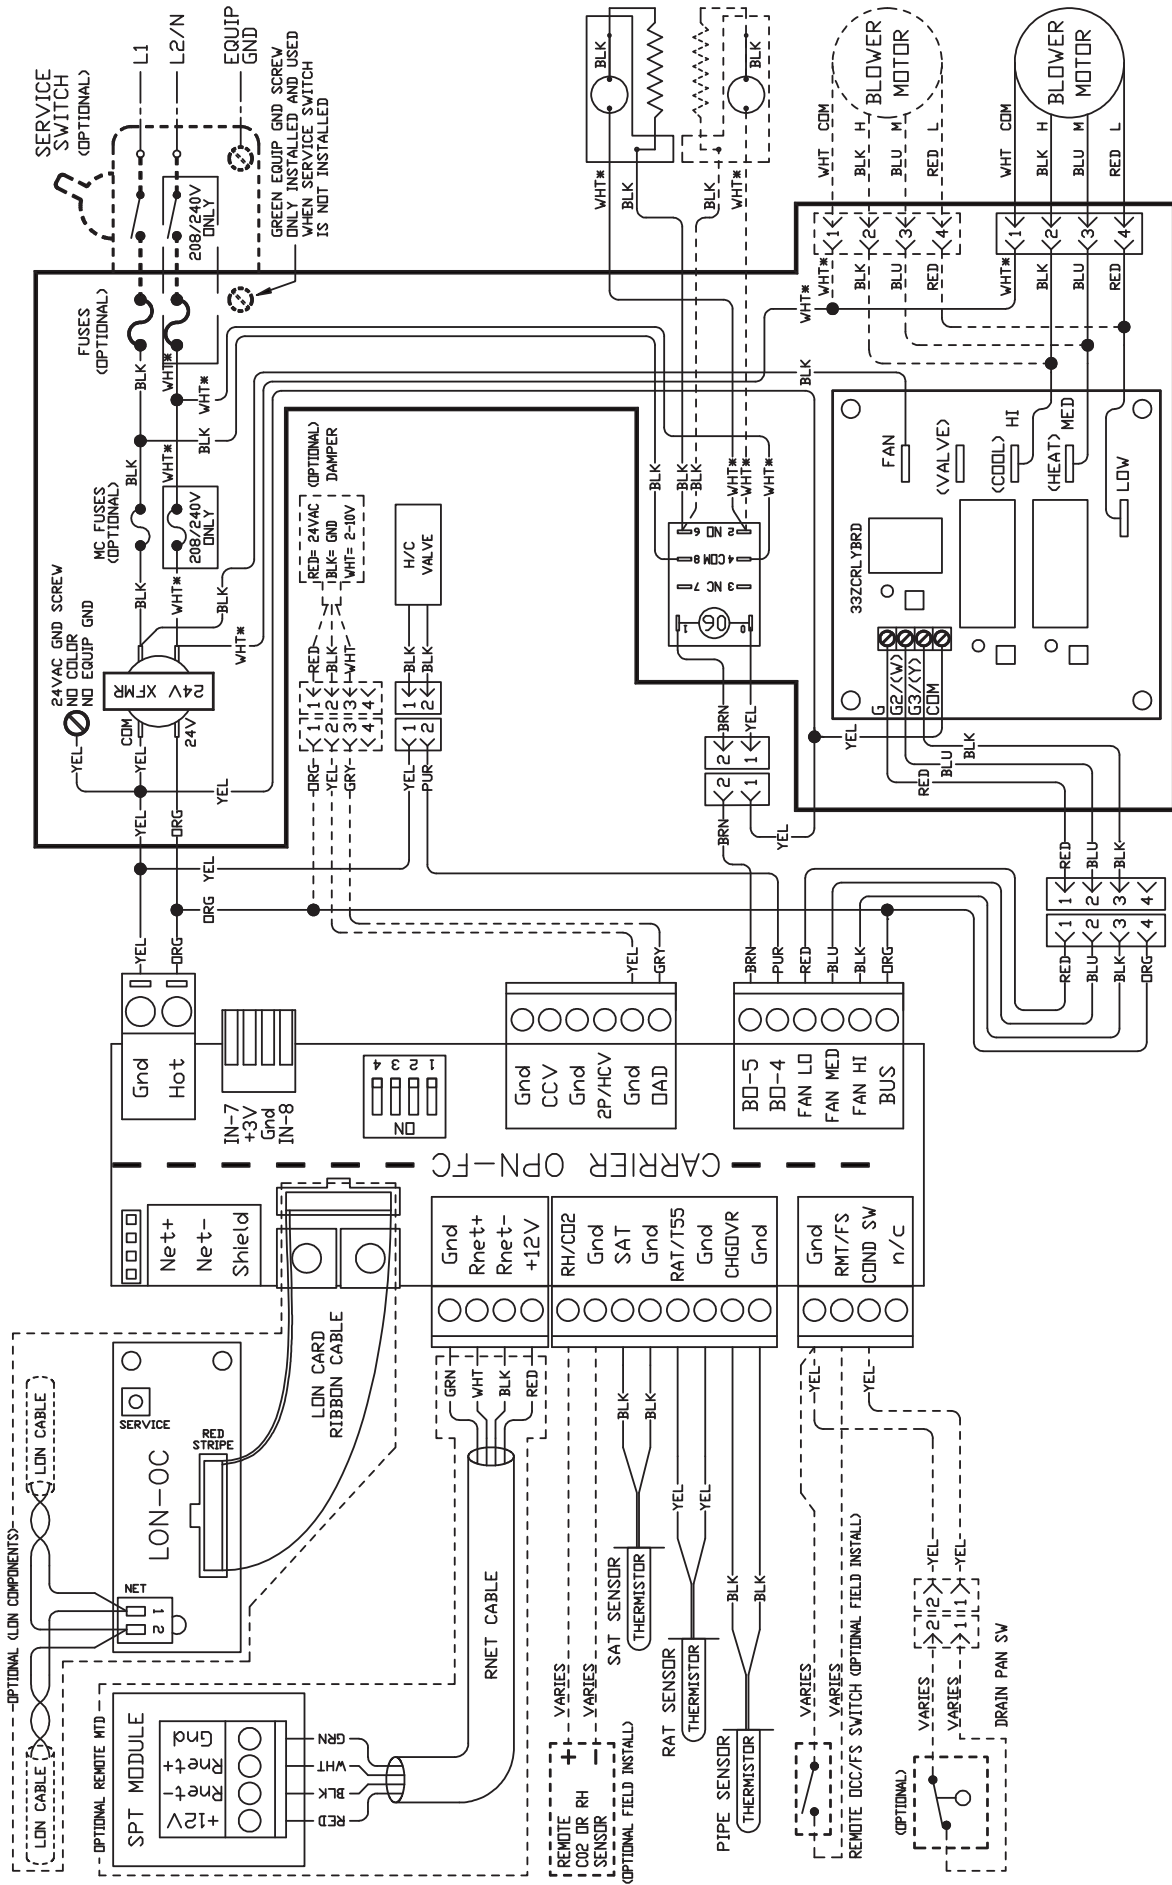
42D (1200-2000 cfm) — 2-Pipe Heating and Cooling with Auxiliary Heat — Open FC Controller (24-v) with Motorized Control Valve (2-Position)
